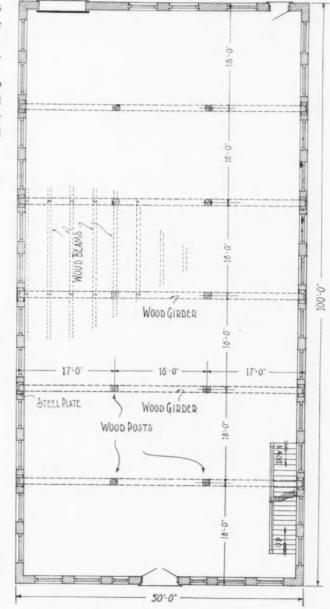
A. Plan Showing Framing of Roof and Floors of Small Factory.
